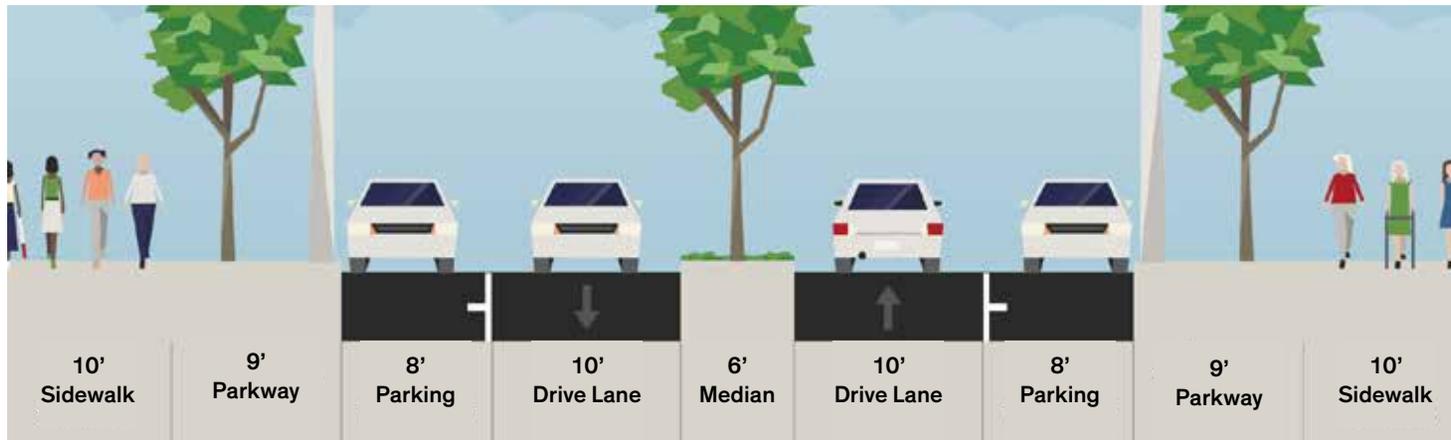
Example of recommended configuration at the Pulaski Road/154th intersection.
